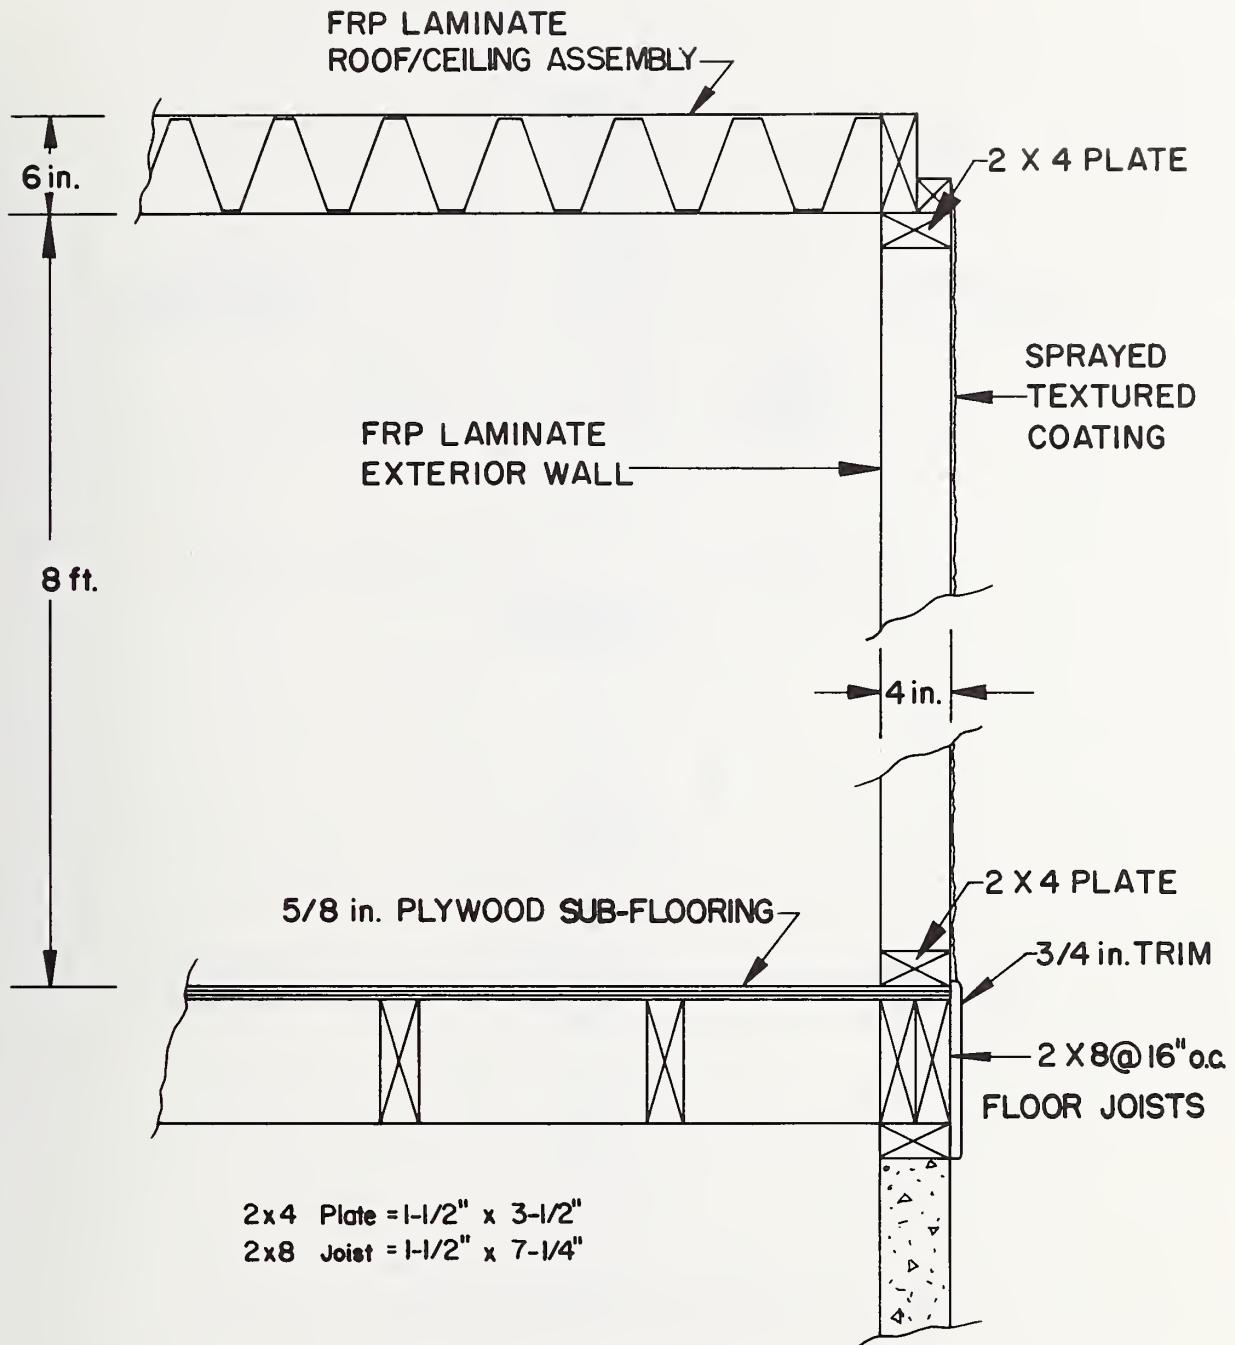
Typical section for the FRP laminate housing system.
